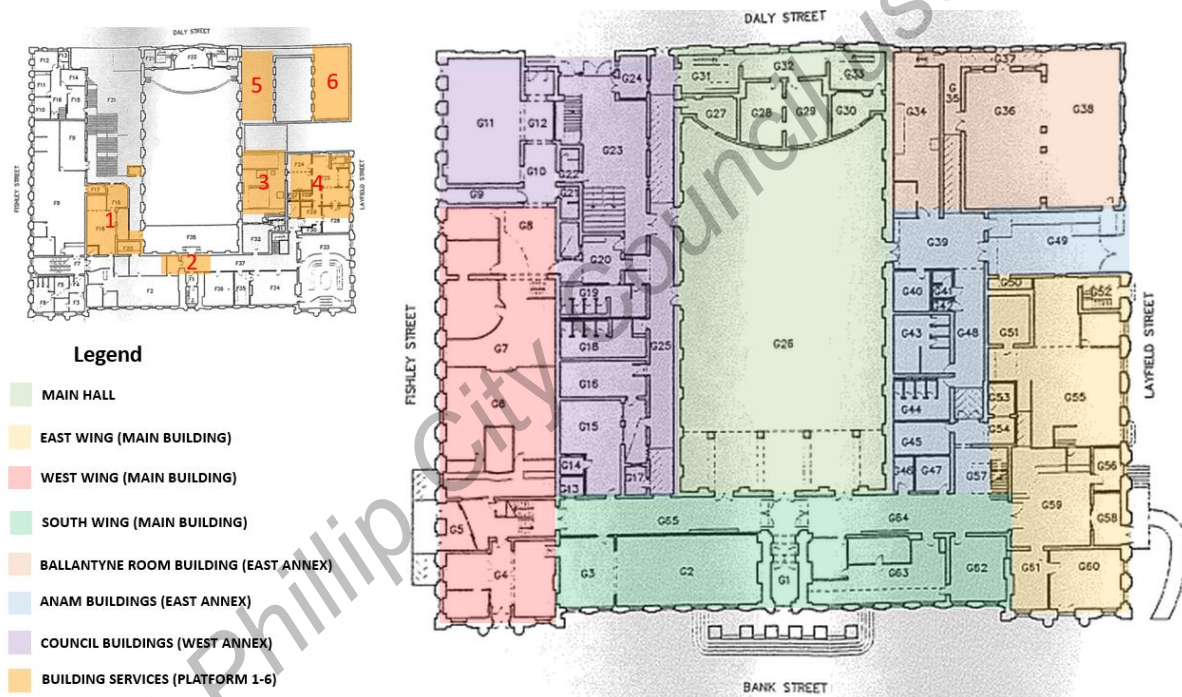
South Melbourne Town Hall site plan arrangement (All arrangements are further elaborated upon in the respective report sections below).
